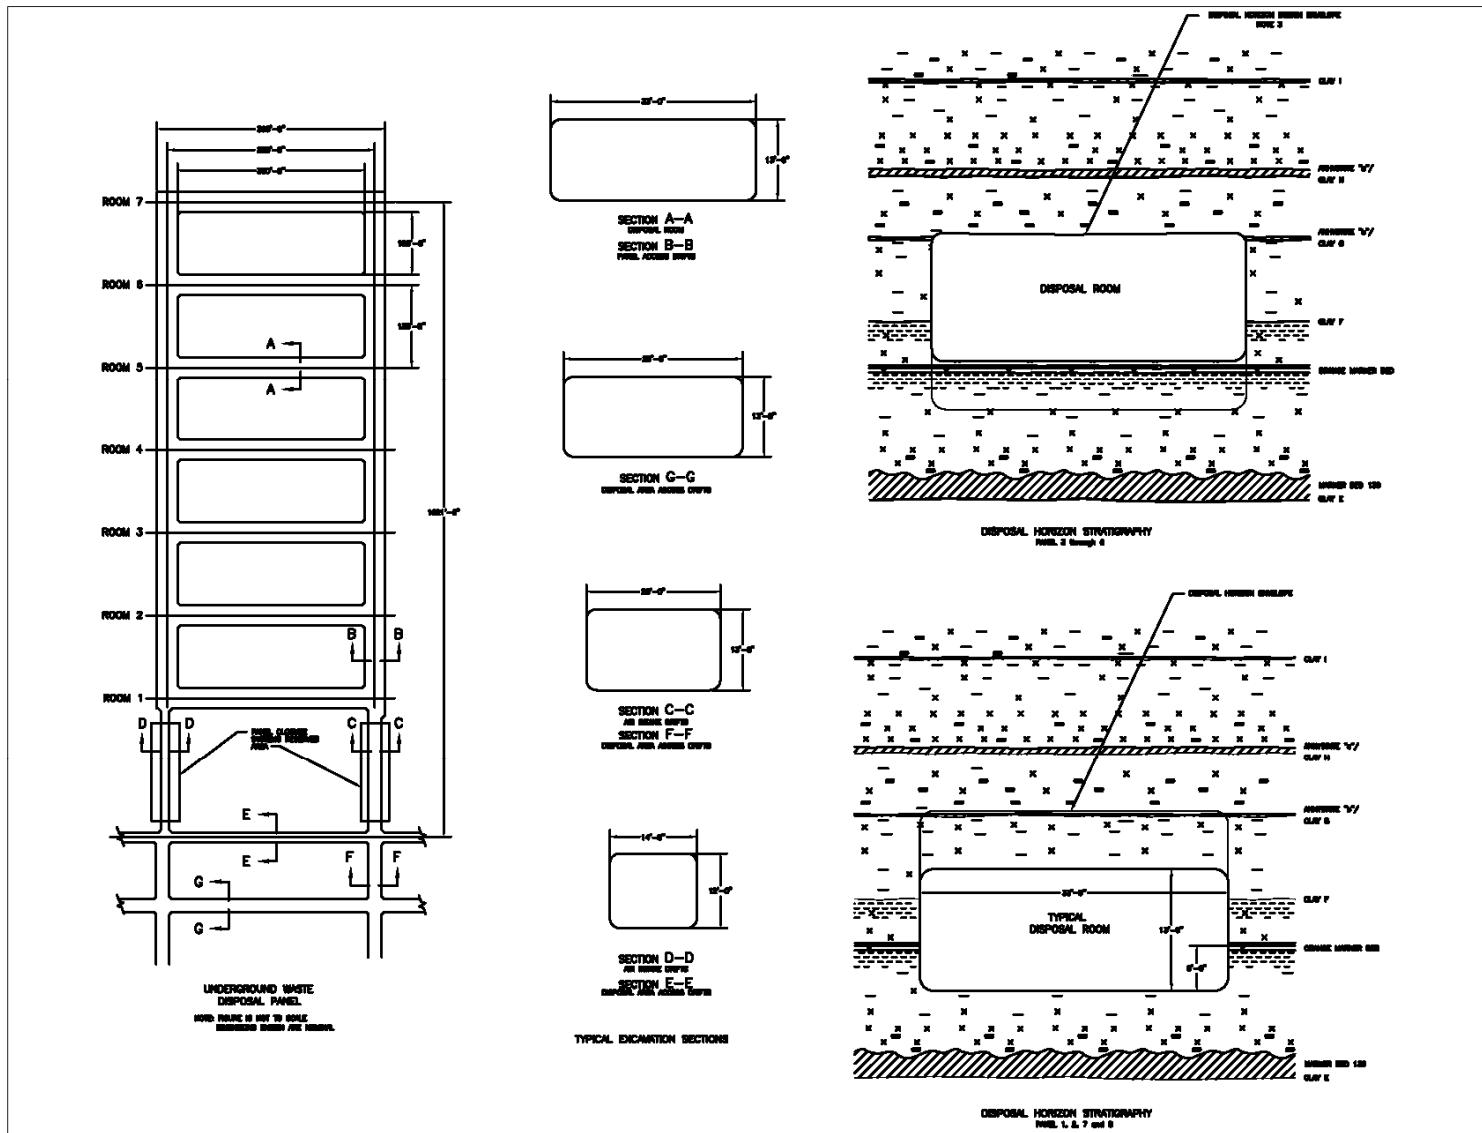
Individual Panel Layout and Dimensions (Source: DOE 2009b)
